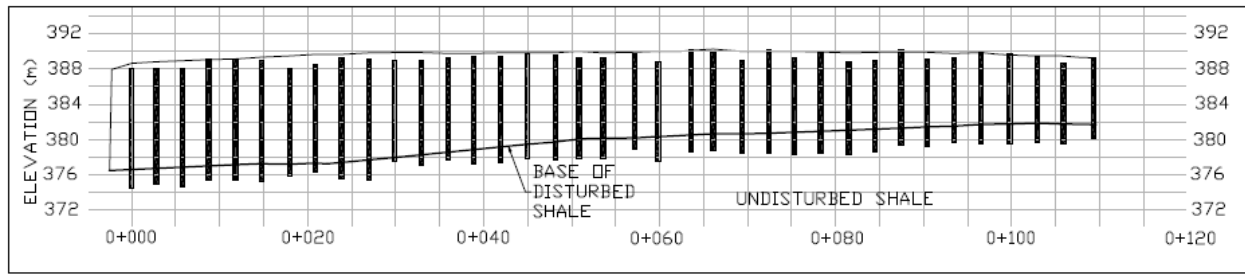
Cross section showing as-built layout of sheet pile walls.
